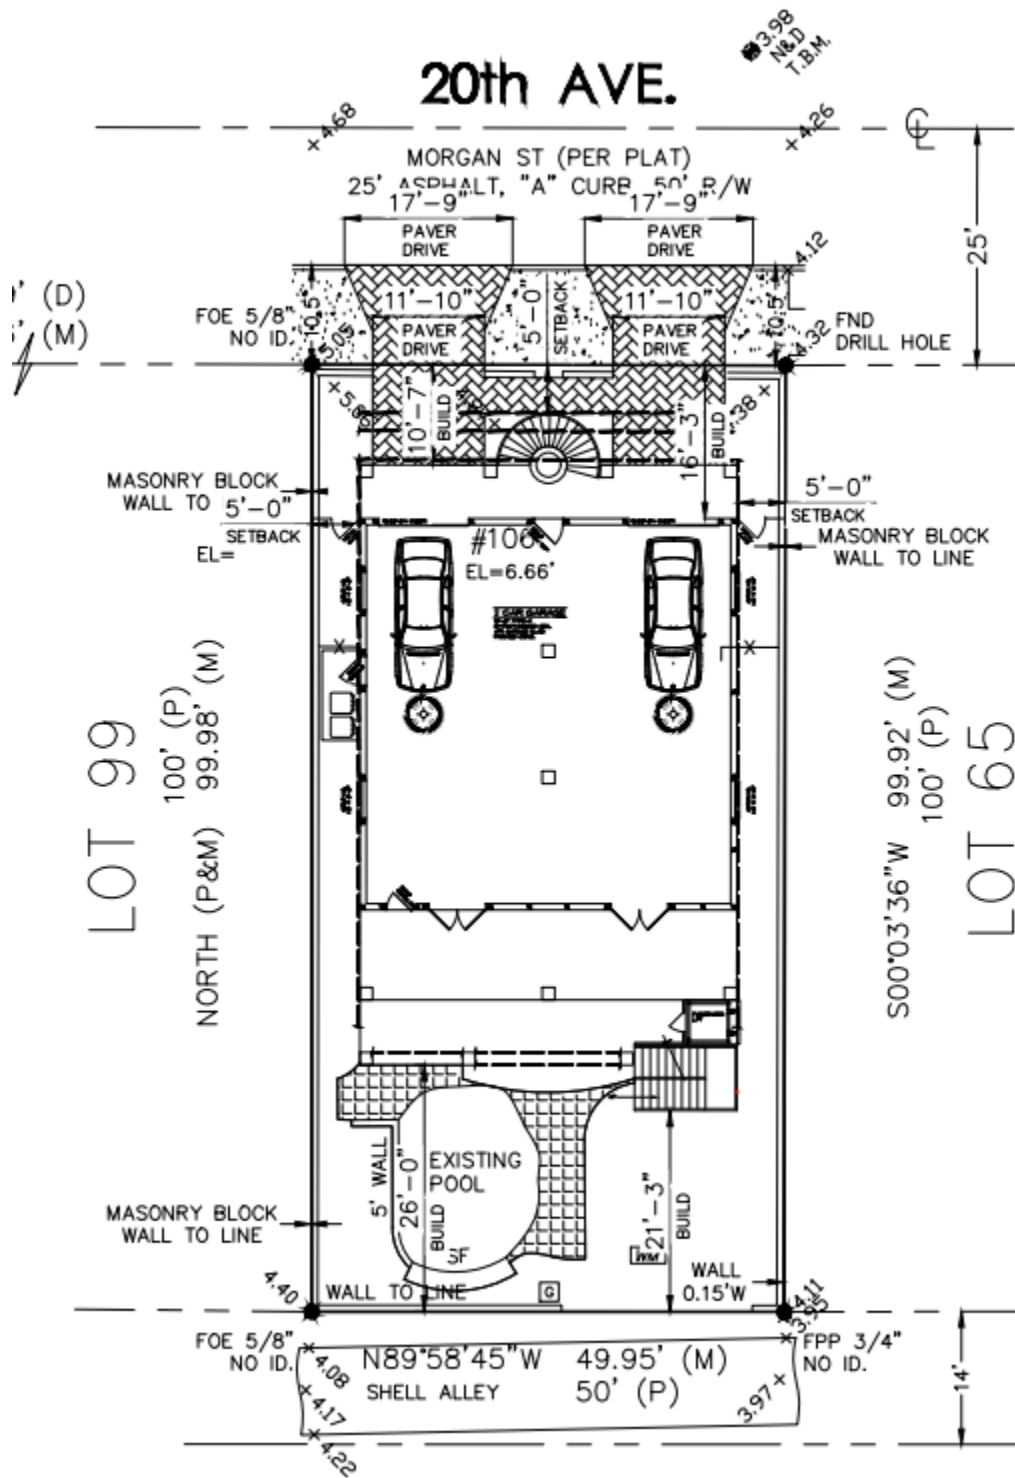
Proposed Site Plan with proposed improvements (N.T.S.)
